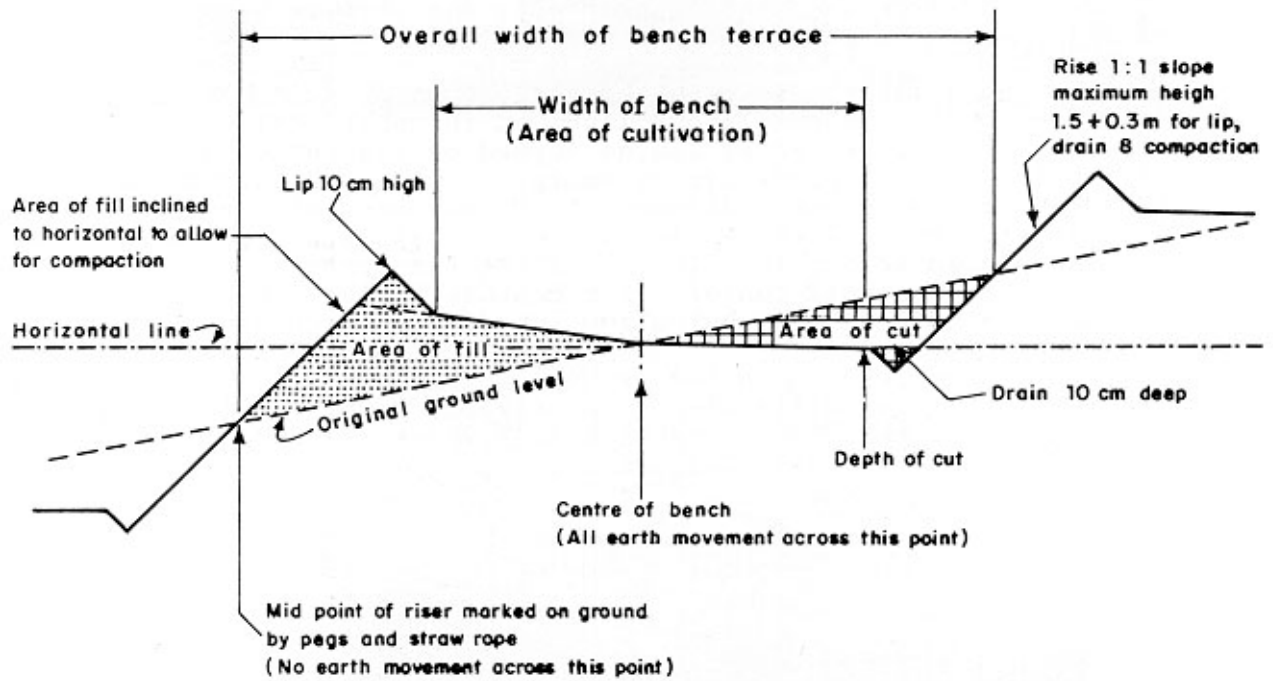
Typical cross section for back-sloping bench terrace (38).
